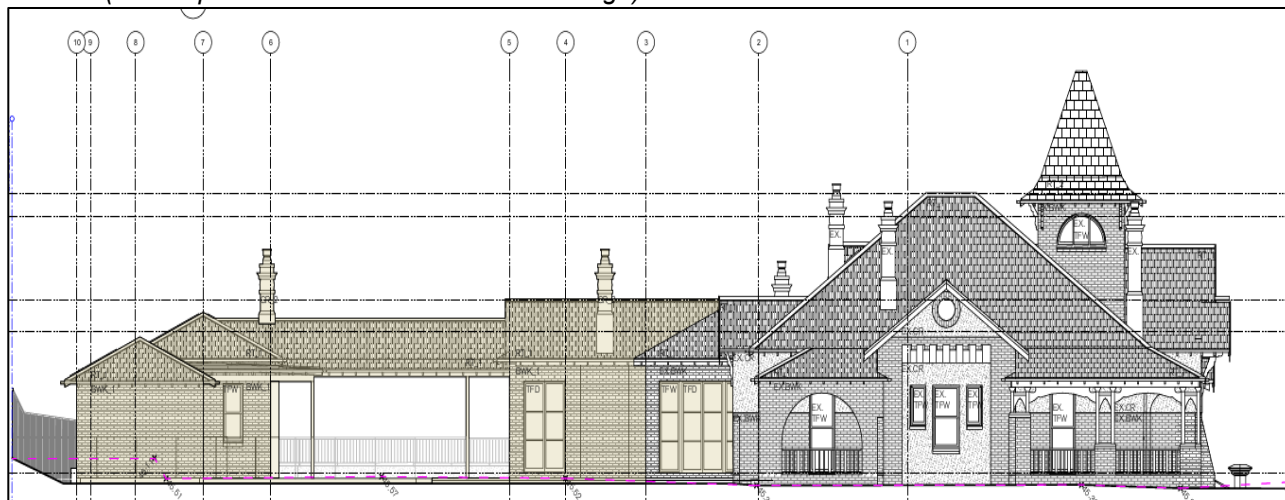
Extract of the applicant's submitted revised South-East Elevation.
